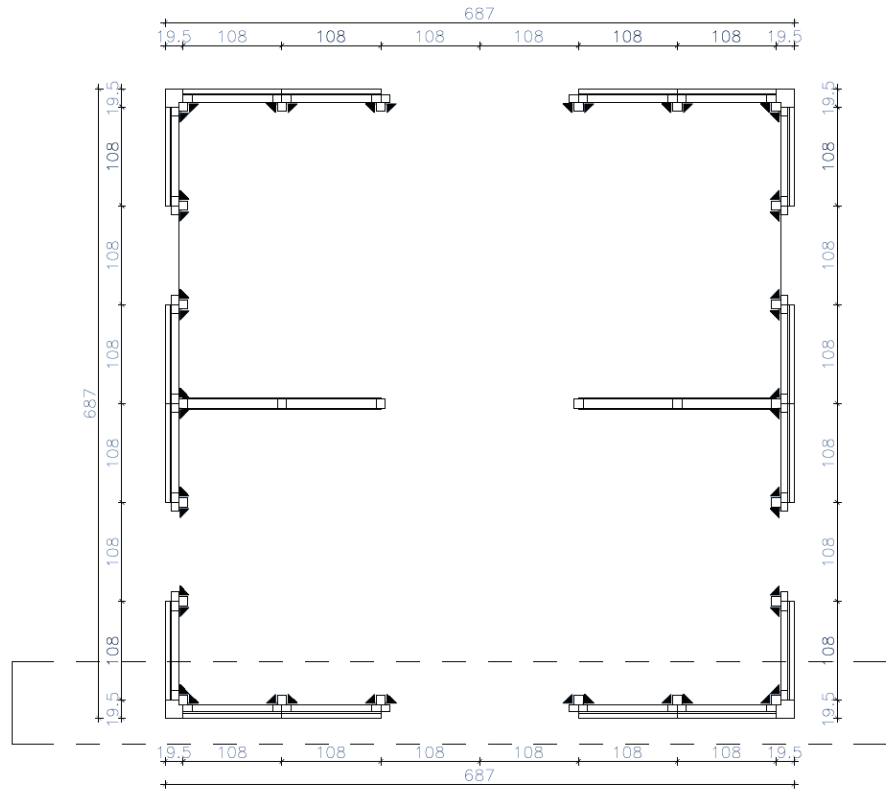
Case-study building. First-storey plan (dimensions in cm).
